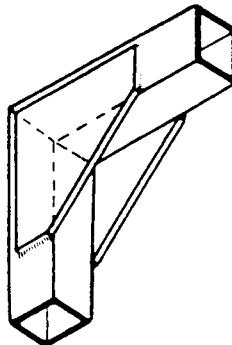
Reinforcement of knee joint with gusset plates
